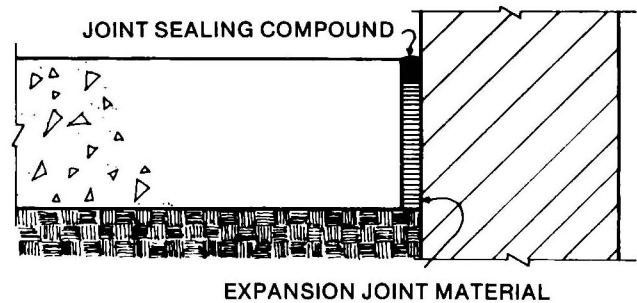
Isolation joints are used between the floor slab and fixed parts of building such as walls, columns, and machinery bases.
